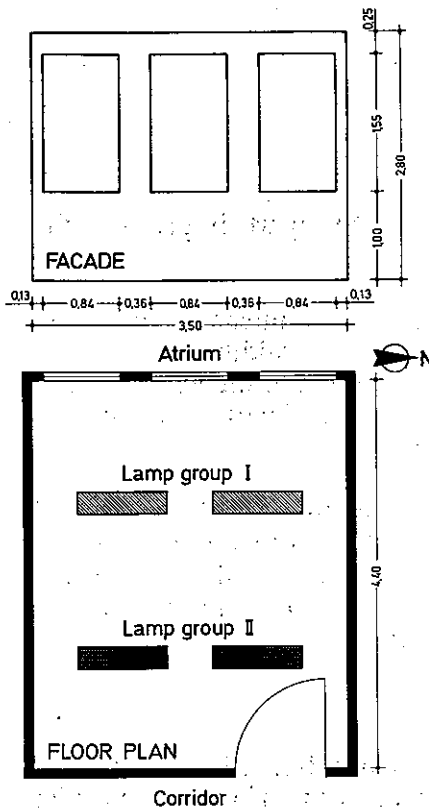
Floor plan and facade view of monitored office room in the Züblin building, Stuttgart.
